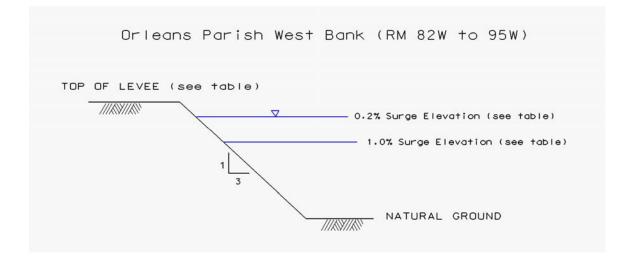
Typical Levee Design Cross-section (RM 82W- RM 95W) – Orleans Parish West Bank
